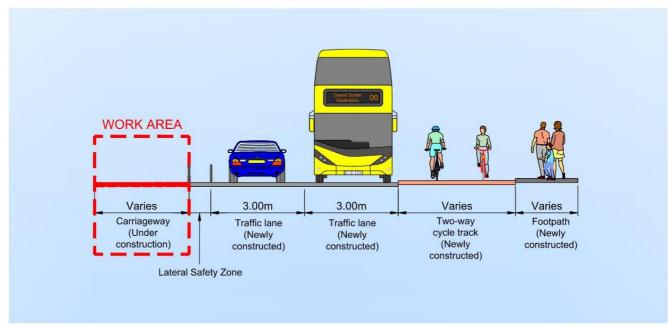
Traffic Management Cross Section, Section 1i – Stage 2
